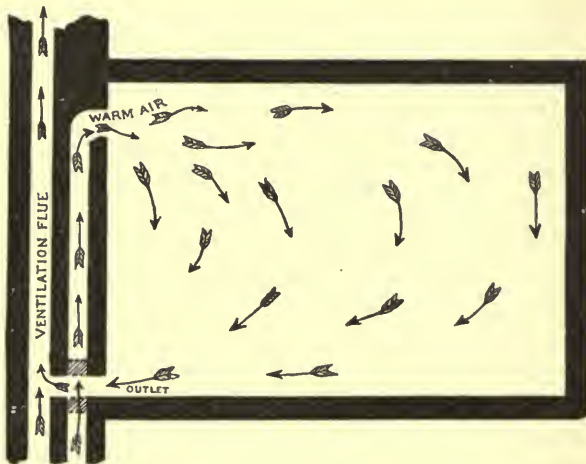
GRAVITY SYSTEM, WITH INLET AND OUTLET ON THE SAME SIDE OF THE ROOM.
